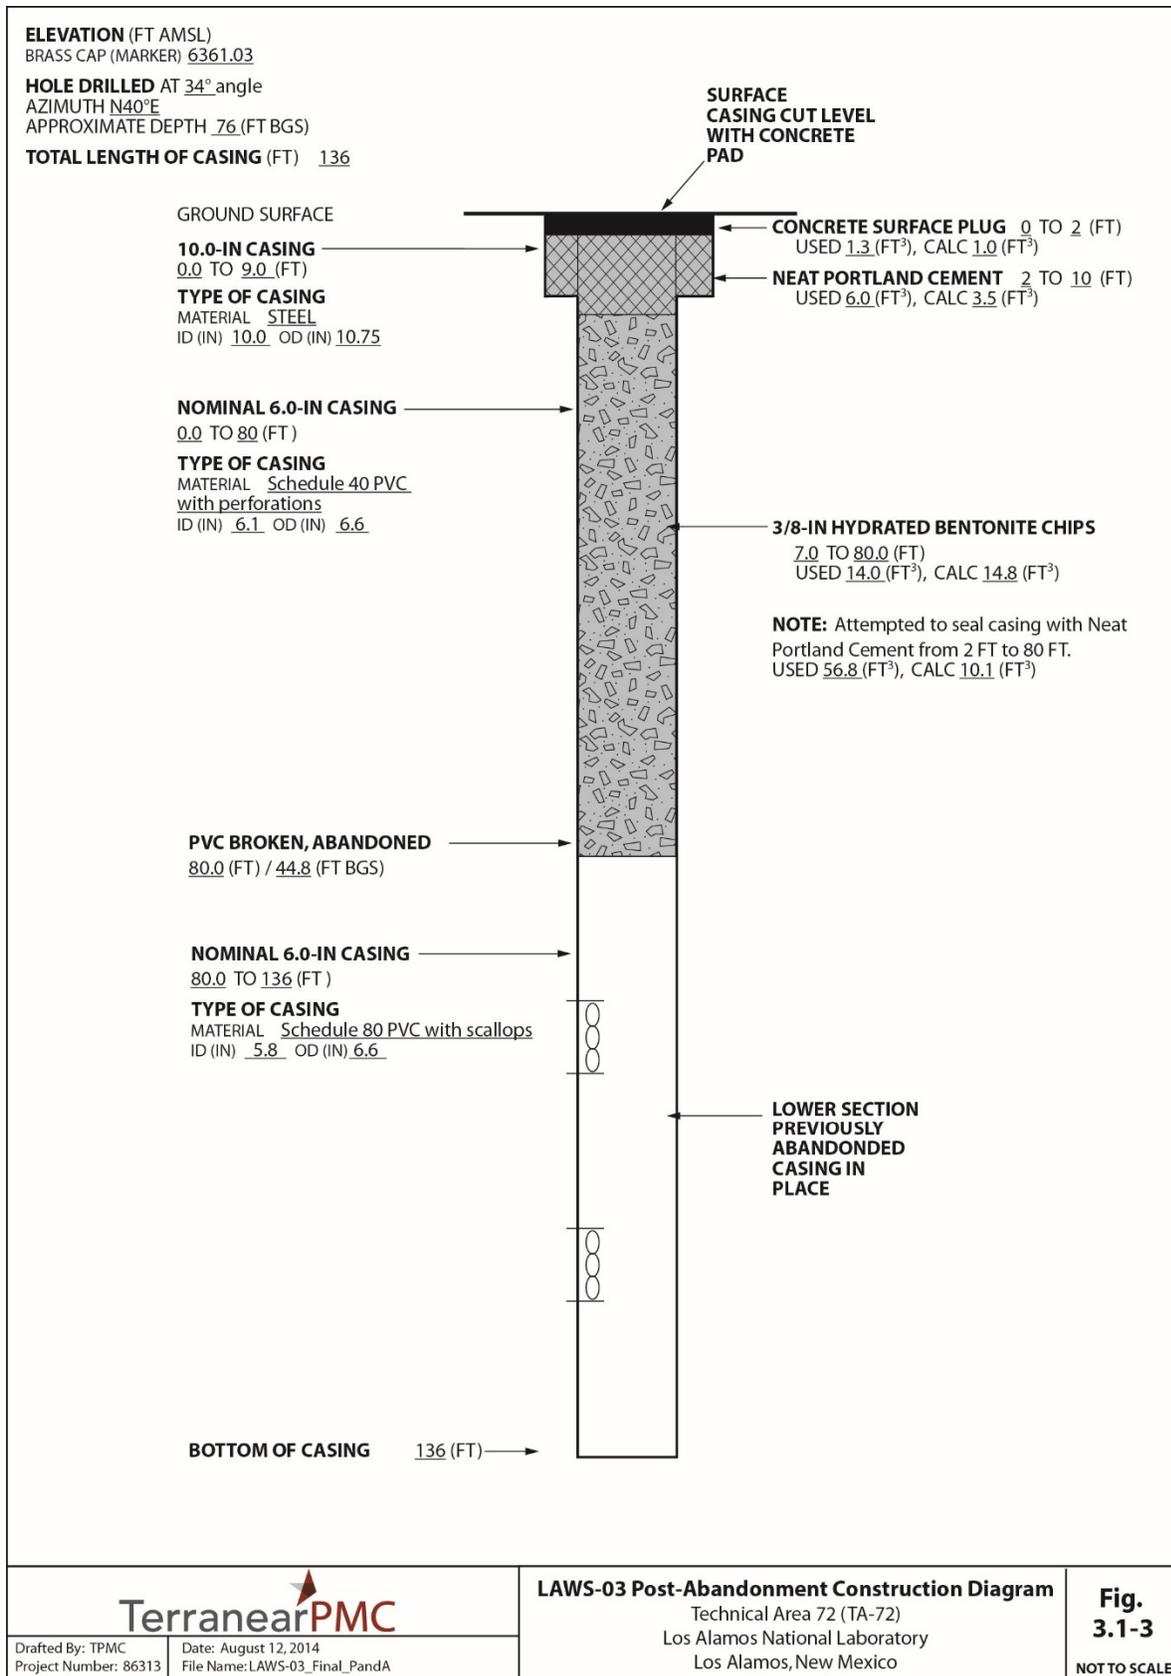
Well LAWS-03 post-abandonment construction diagram
